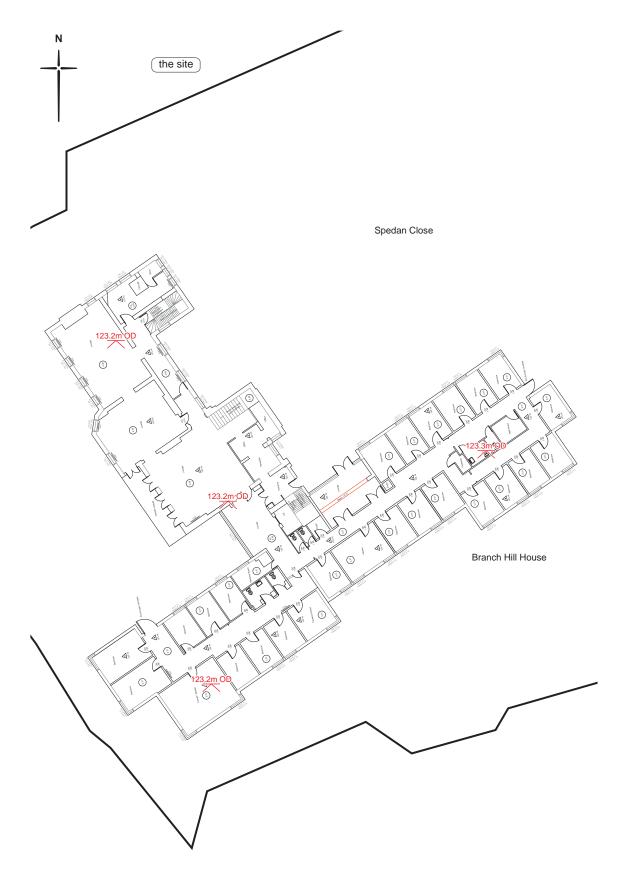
Existing basement plan (Merebrook Consulting, Job No. MER00520, Dwg. No. 002/003, April 2013)
